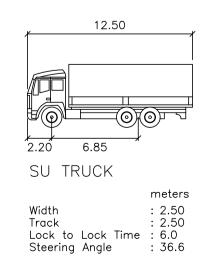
/801 Rev E – 15m Toll Tanker Vehicle Drawing 19-3-34/802 Rev C – Boat and Caravan Options Drawing 19-3-34/803 Rev B – Single Unit Truck
